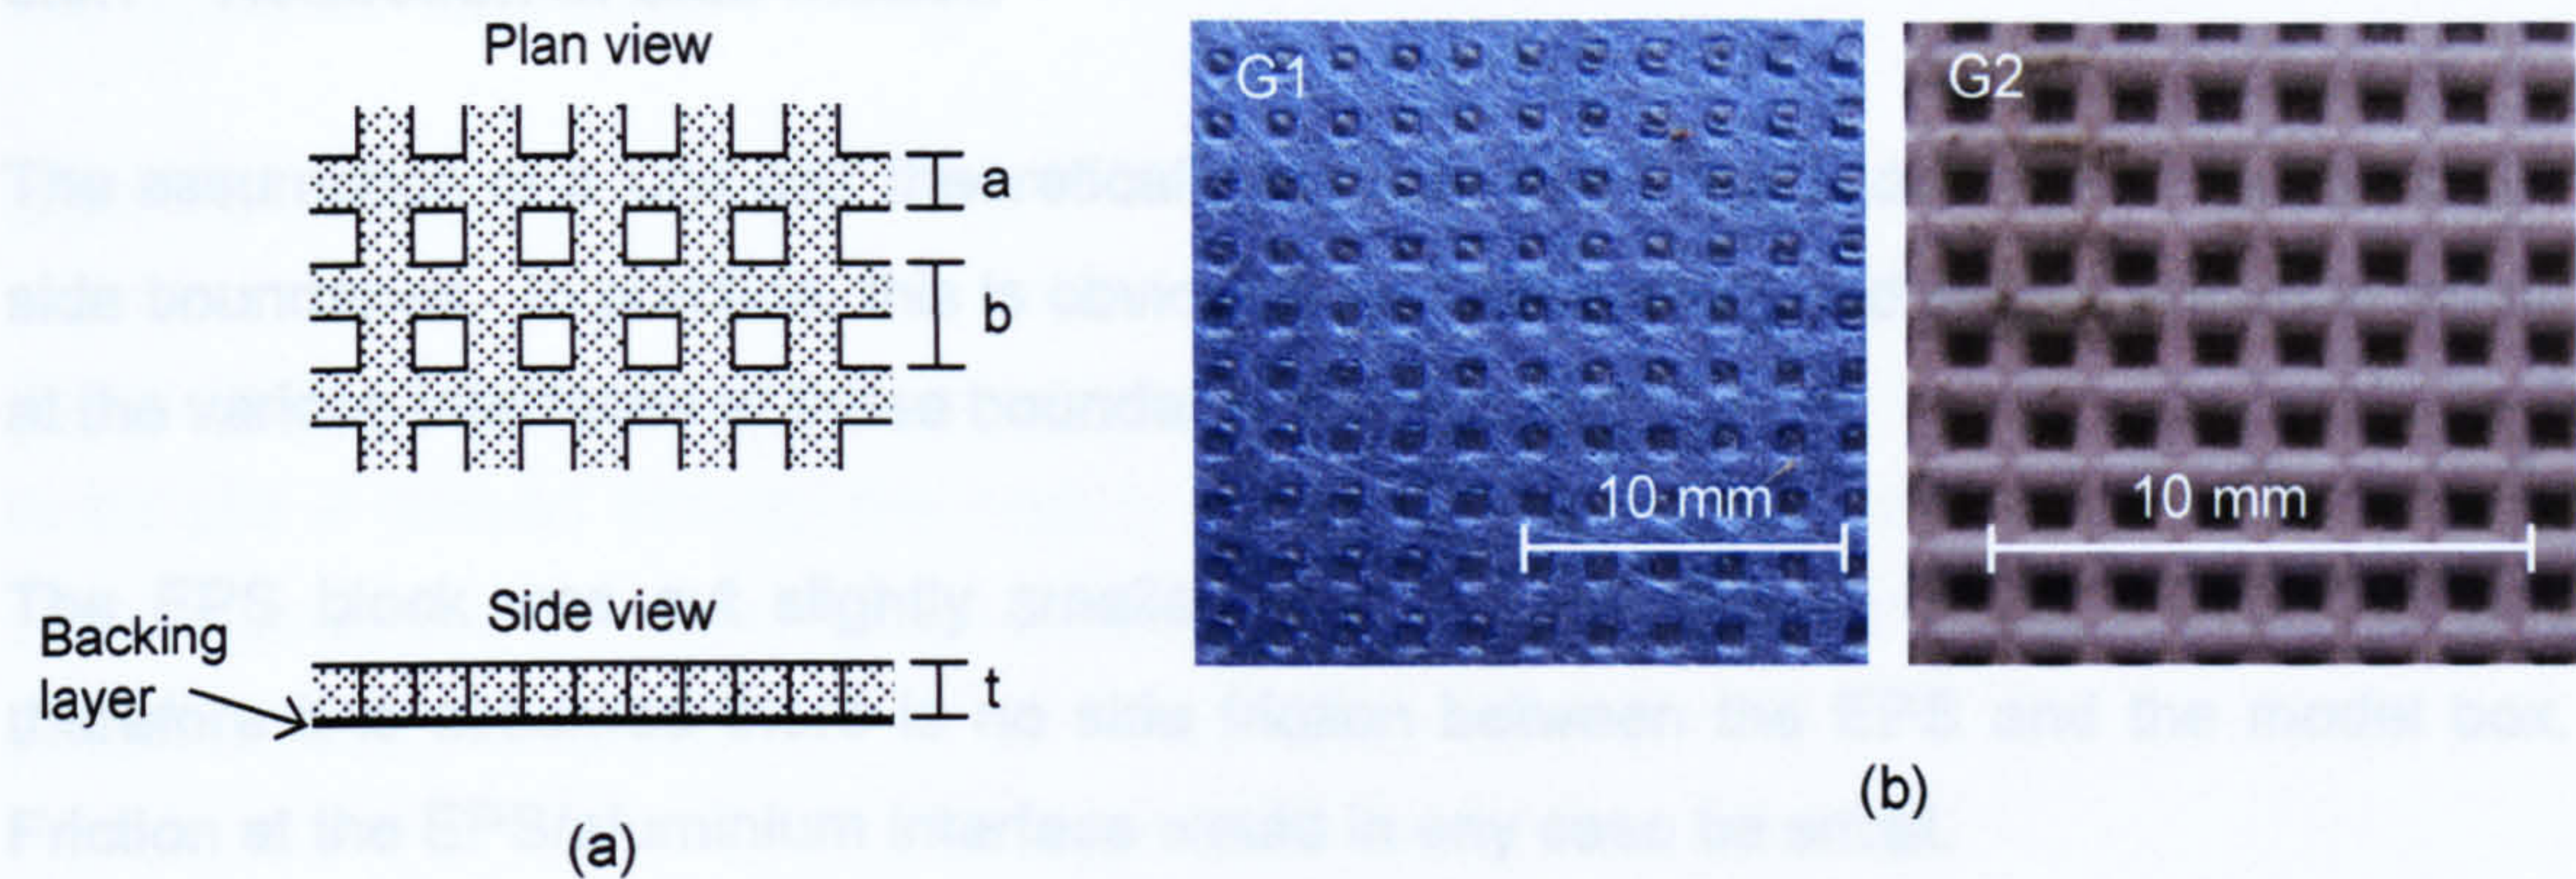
Shape and dimensions of reinforcement (not drawn to scale): (a) Schematic view with dimensions (see Table), (b) Photos
